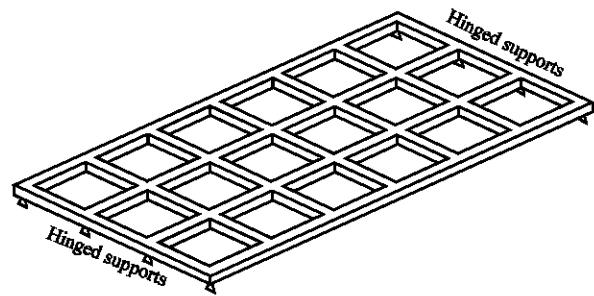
Grillage mesh showing transverse beams parallel to supports
